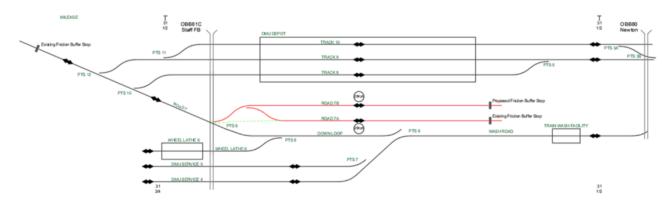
Drogheda McBride Station, Proposed Stabling Track Scheme
